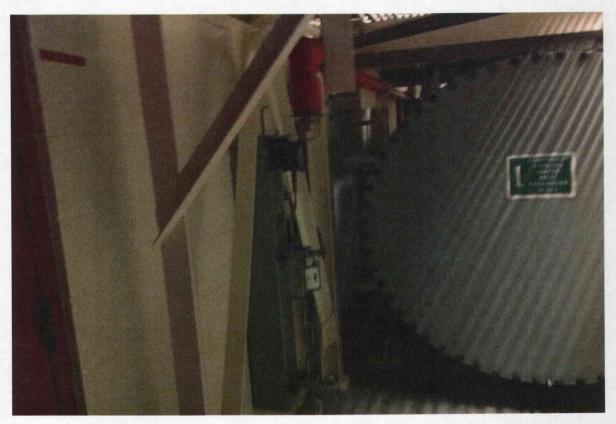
General View of Room 328 Masonry Wall Adjacent to Heat Exchange E22-1
